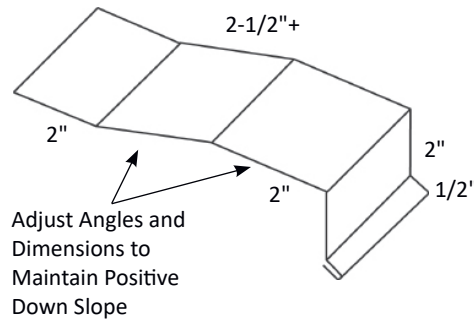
Eave Flashing with Cant Strip Dimensions
